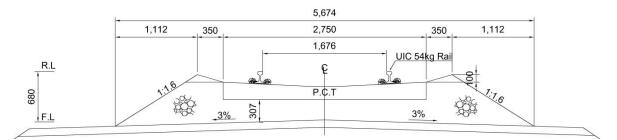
Cross-section of Ballasted Single Track on Earth Work (2Phase)
